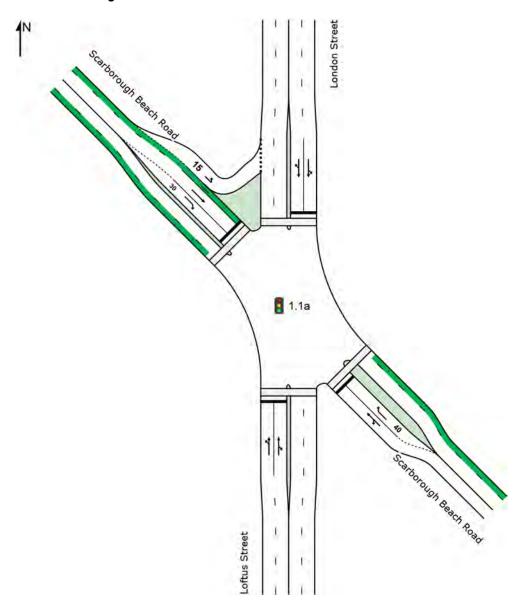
Scarborough Beach Road / Loftus Street / Loftus Street – SIDRA Schematic Geometry
